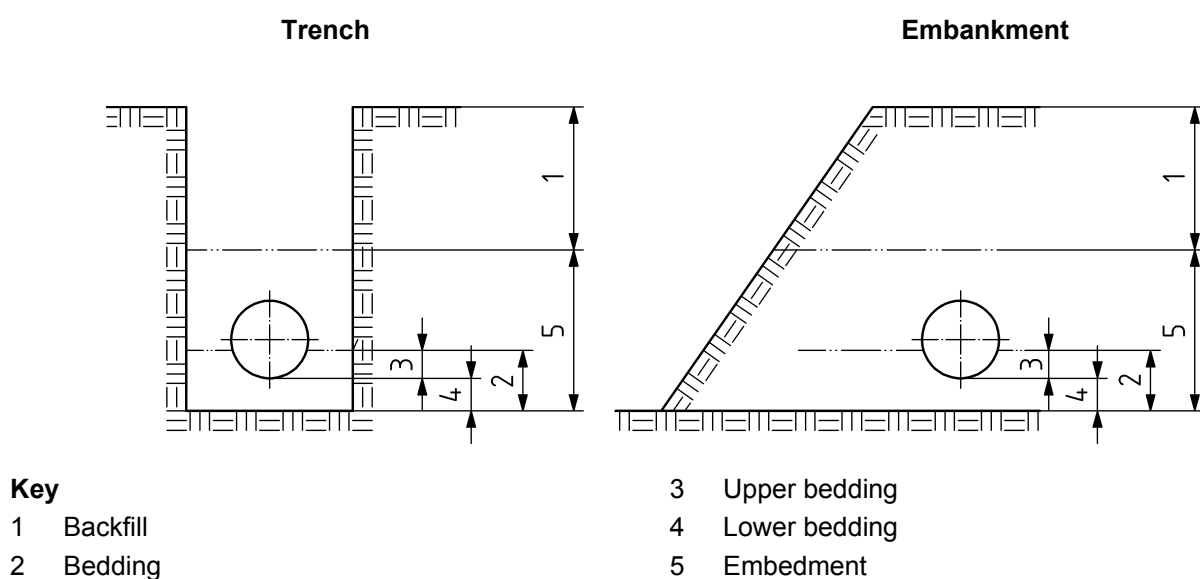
Installation terms used in pipe laying in trenches and under embankments
